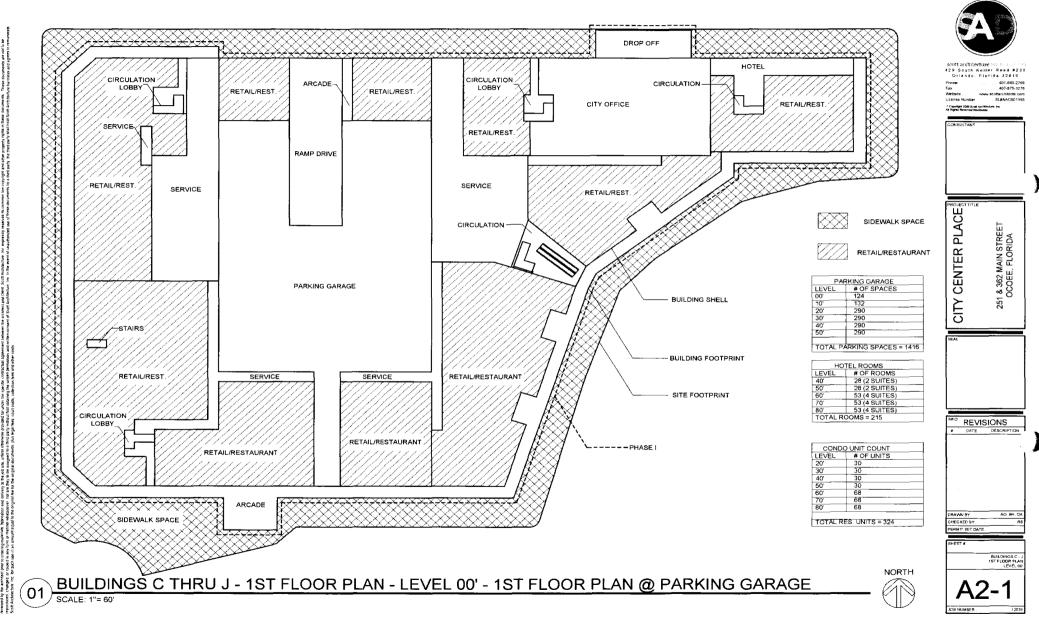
EXHIBIT A – PROJECT RENDERINGS, SITE PLANS, CONDO UNIT FLOOR PLANS
